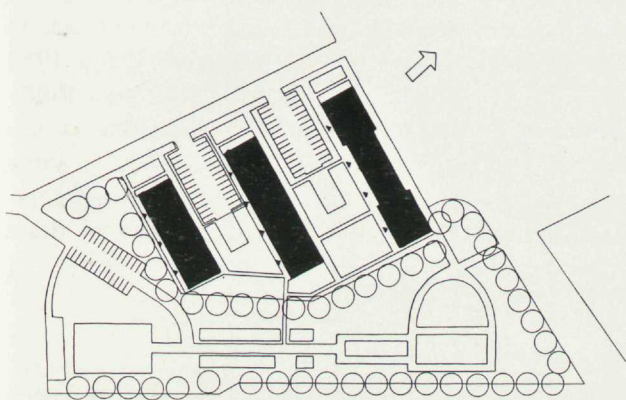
shows how parking has been arranged in the block, the cars being parked at an angle along the street and access permitted over the sidewalks. For reasons of traffic safety, this solution is not acceptable. However, the playgrounds on the site are not affected.
